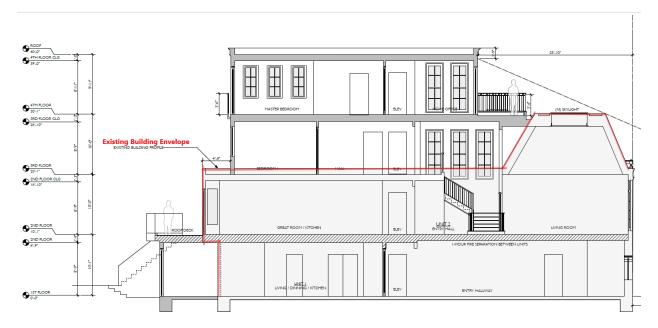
Proposed vertical and horizontal expansion – eastern facade
